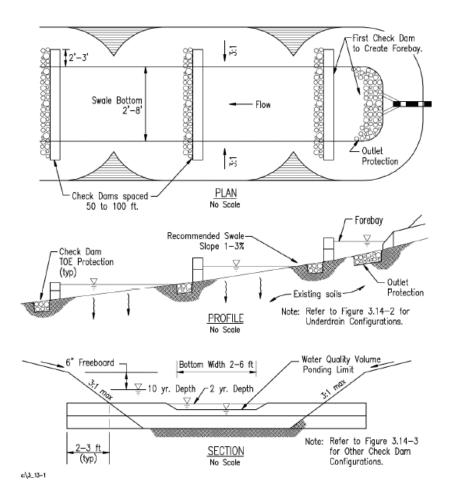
Typical Swale with Check Dam Configuration (VA DEC, 1999)
